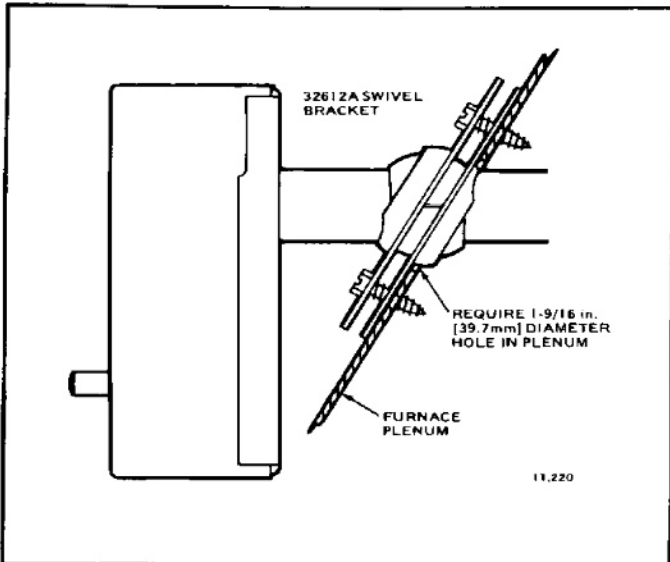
SWIVEL MOUNTING. REQUIRES A 1-9/16 in. [39.7 mm] DIAMETER HOLE FOR ELEMENT INSERTION.
